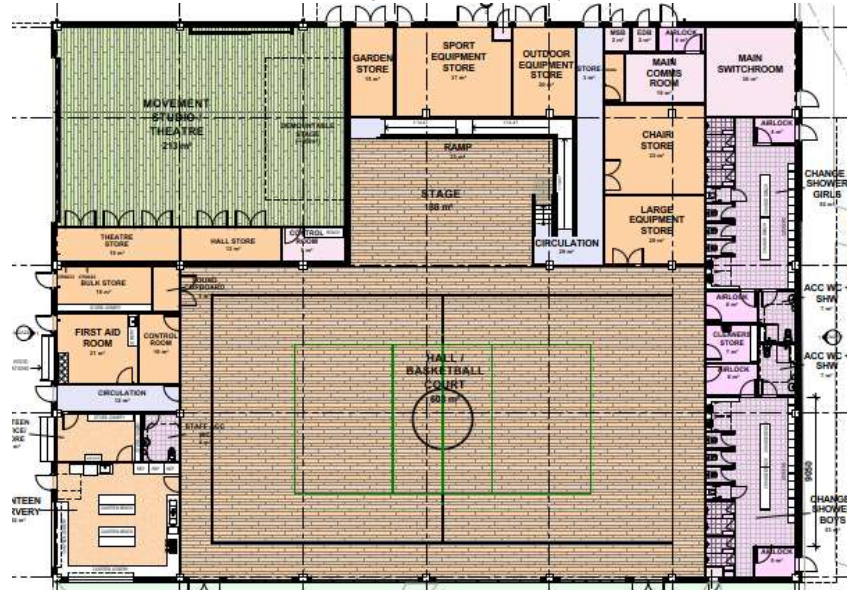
Building B Hall with large quantity of amenities and storage provided (Source: EJE Architecture)
